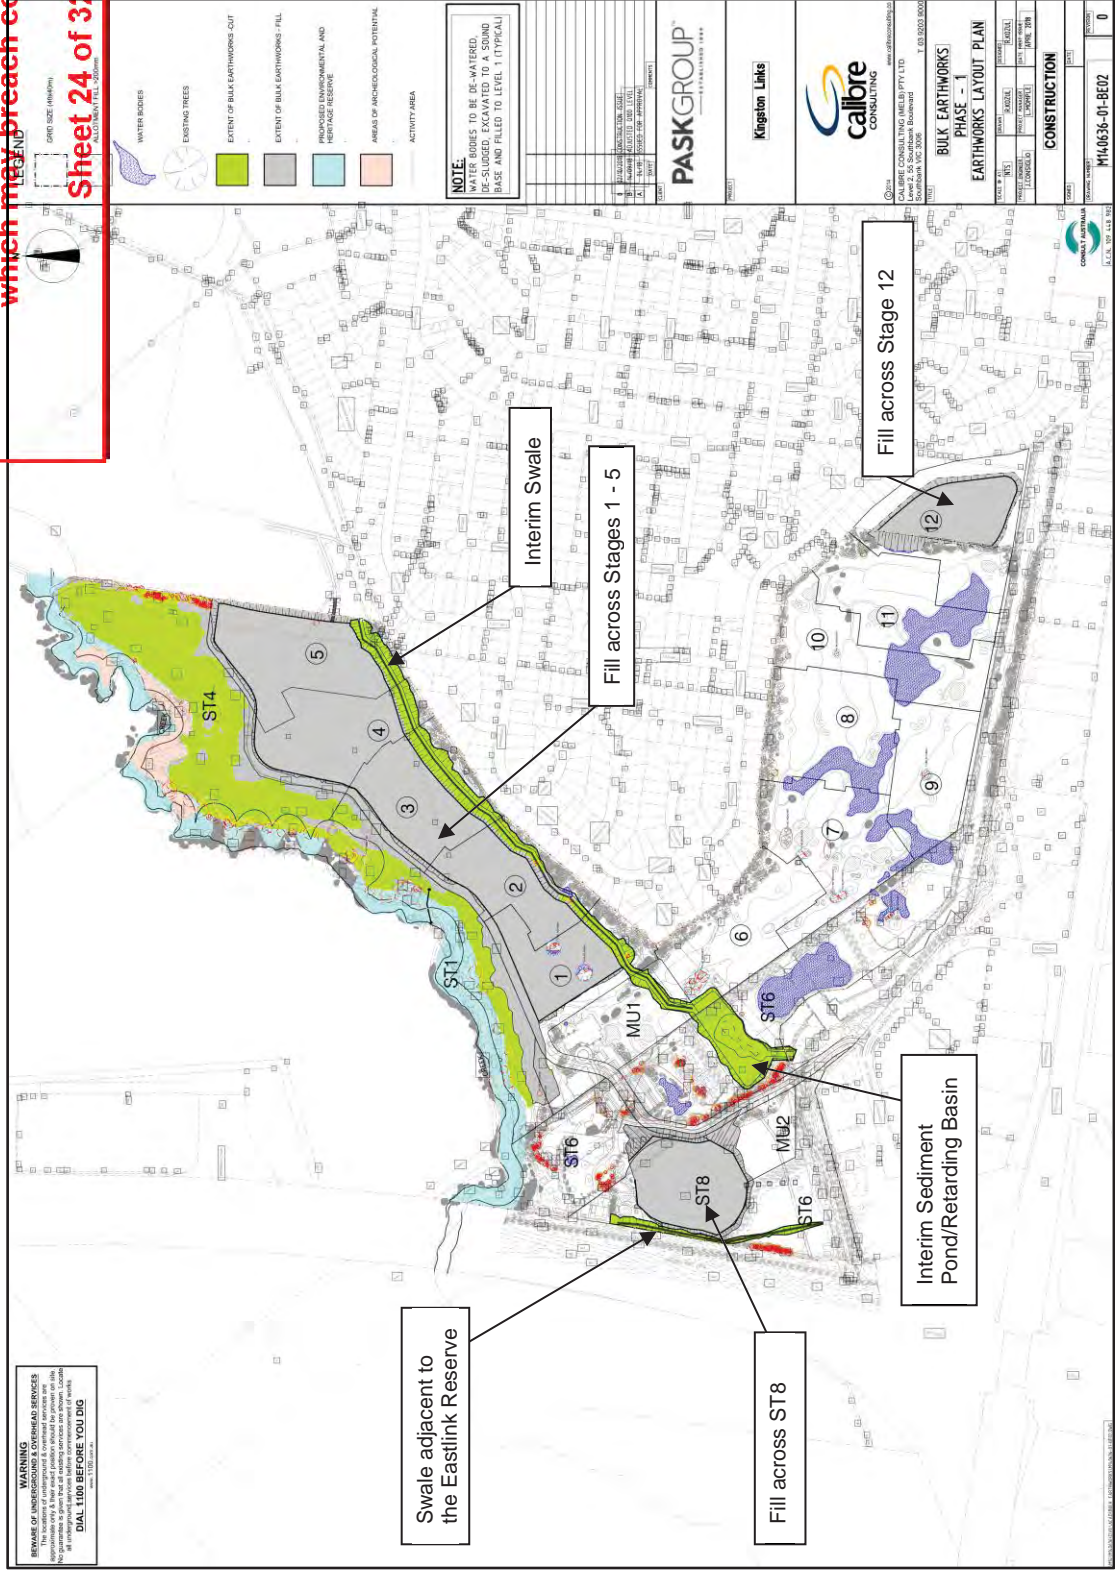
Phase 1 Bulk Earthworks Design Plan (Calibre Consulting, 2018)
